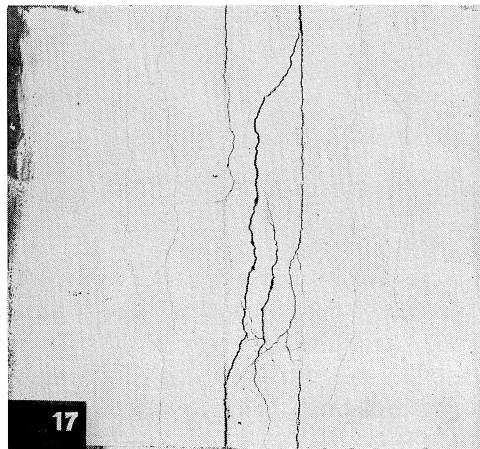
Failure pattern of a loop connection with transverse reinforcement (No. 140 in Appendix 2).
